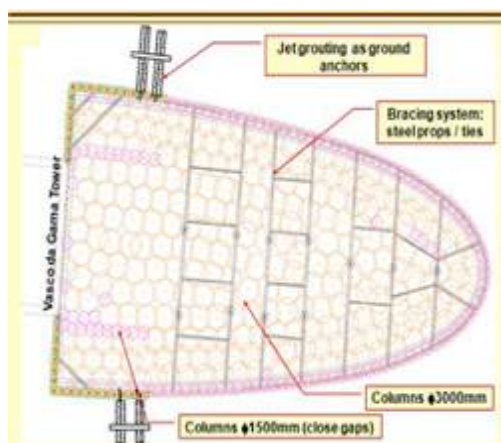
Plan of jet grouting solutions and cofferdam bracing systems.
